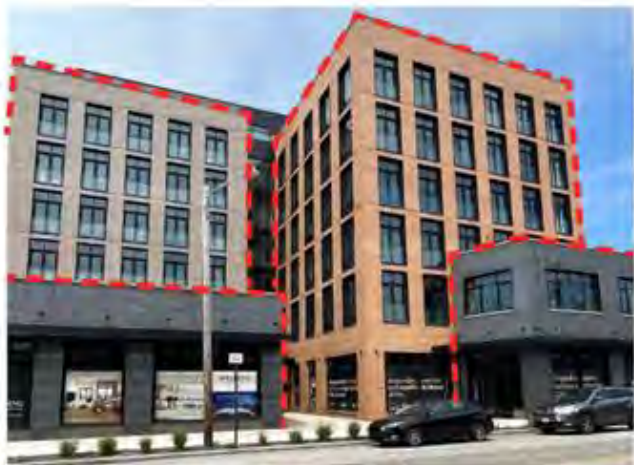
| MULTIPLE BUILDINGS WITHIN A SINGLE PROJECT
